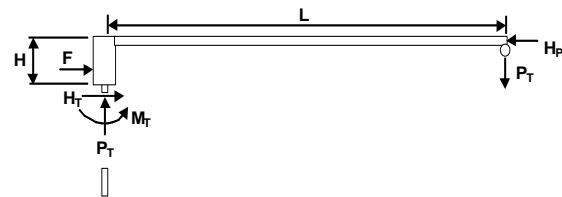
Pile Vertical Load Due to Earth Pressure on the Abutment
